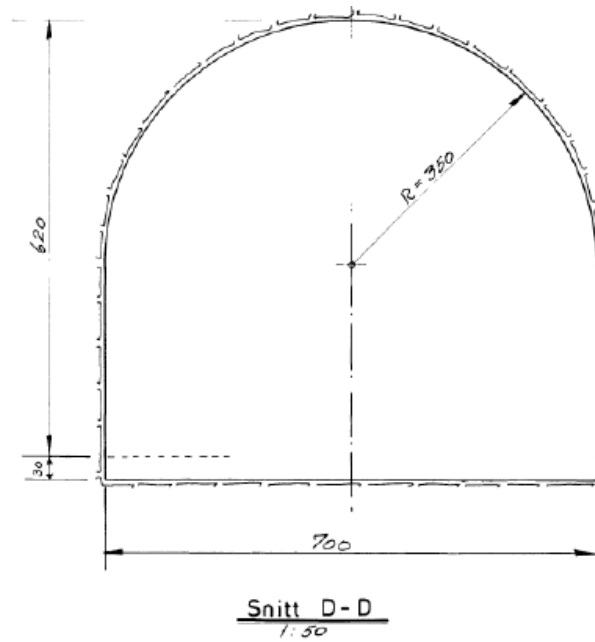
Cross section of the headrace tunnel after the asphalt removal
